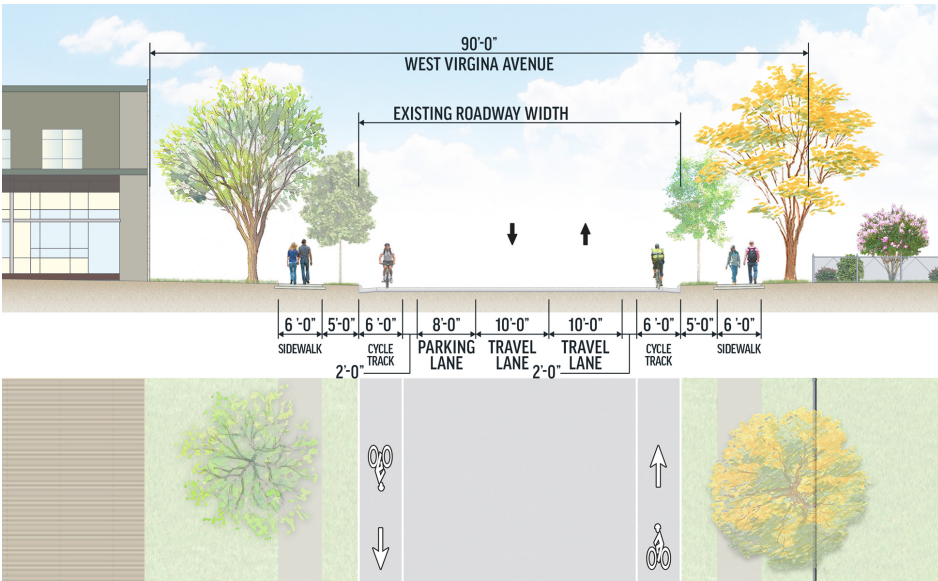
Typical streetscape section of one way cycle tracks along West Virginia Avenue NE that connect the 16th Street NE intersection to Montana Circle.
